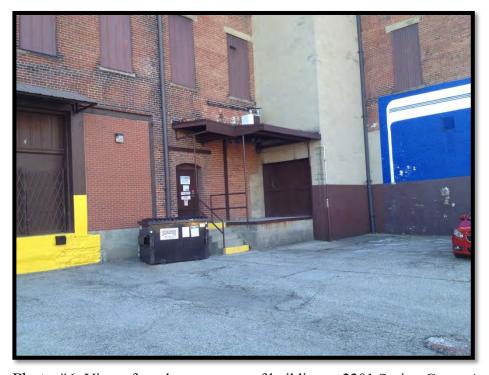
View of northwest corner of building at 2201 Spring Grove Avenue.
